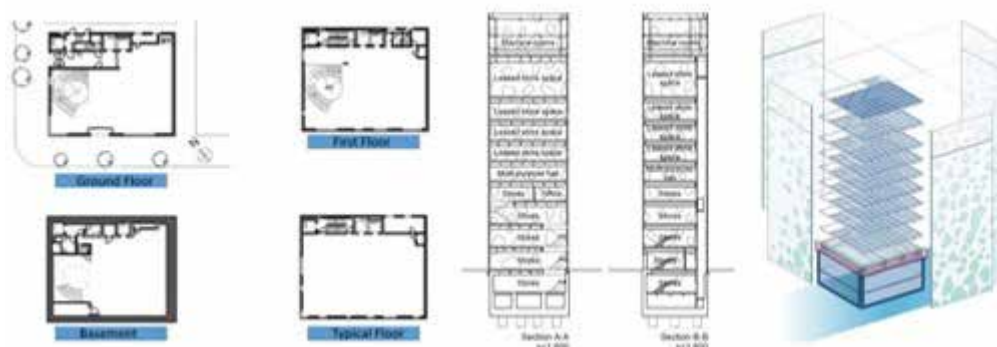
Mikimoto Ginza 2, the basement, ground floor, first floor, typical floor and the elevation view
